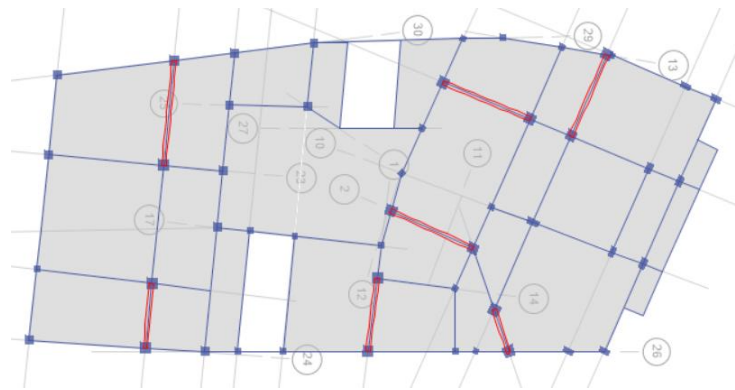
The current floor layout, showing the structural walls that were inserted
